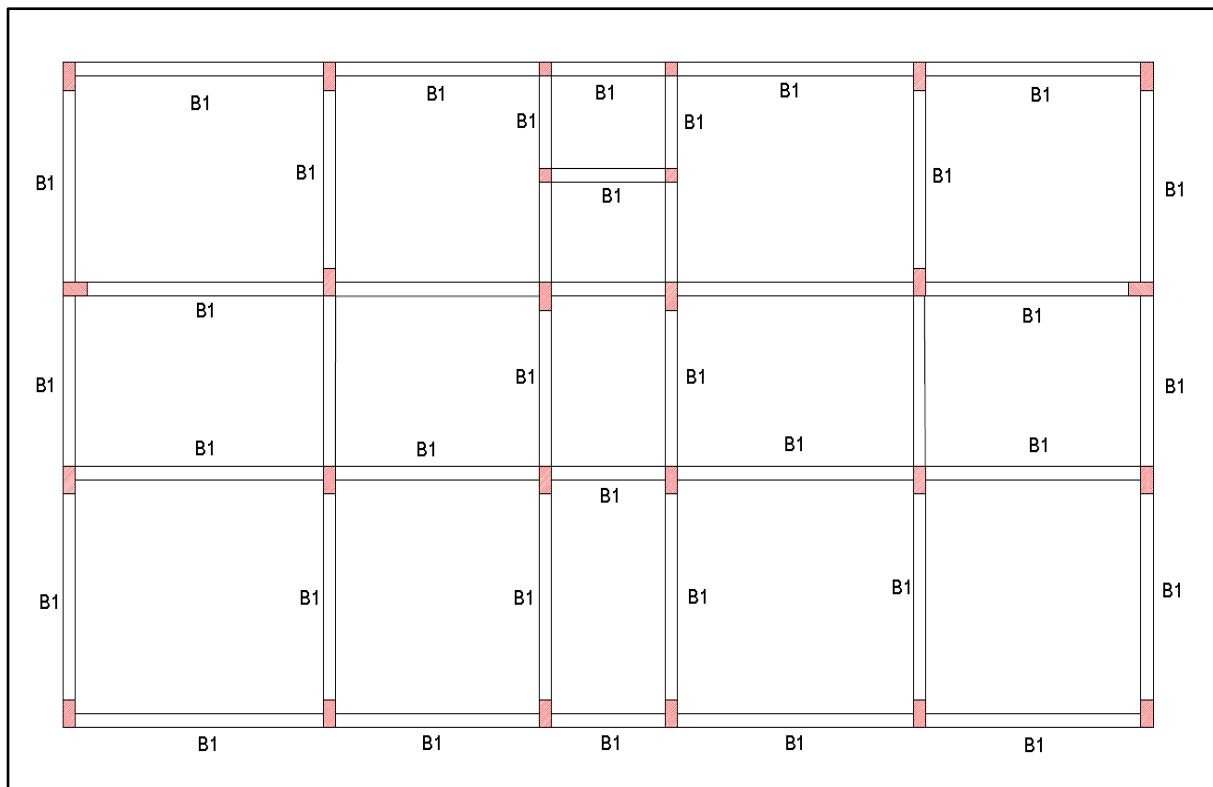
Building without Shear Wall in AutoCAD Plan
